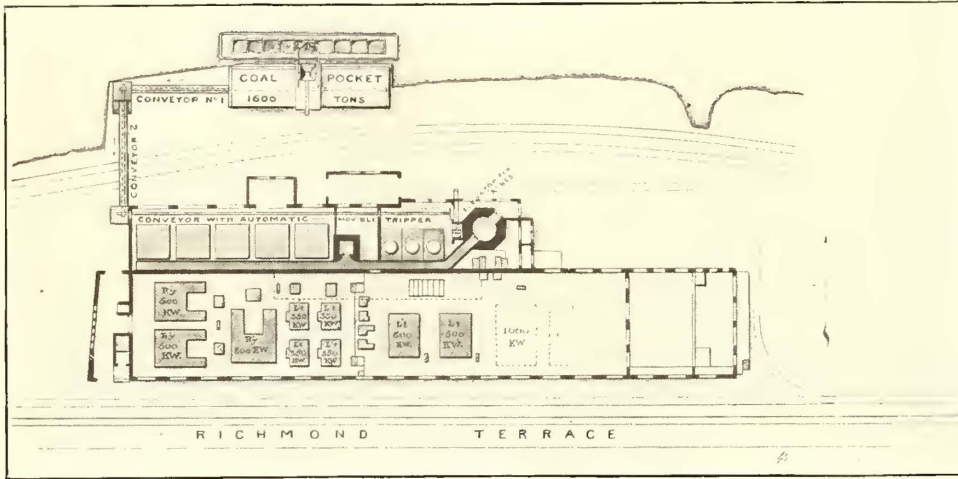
PLAN OF RICHMOND LIGHT & RAILWAY POWER EQUIPMENT
